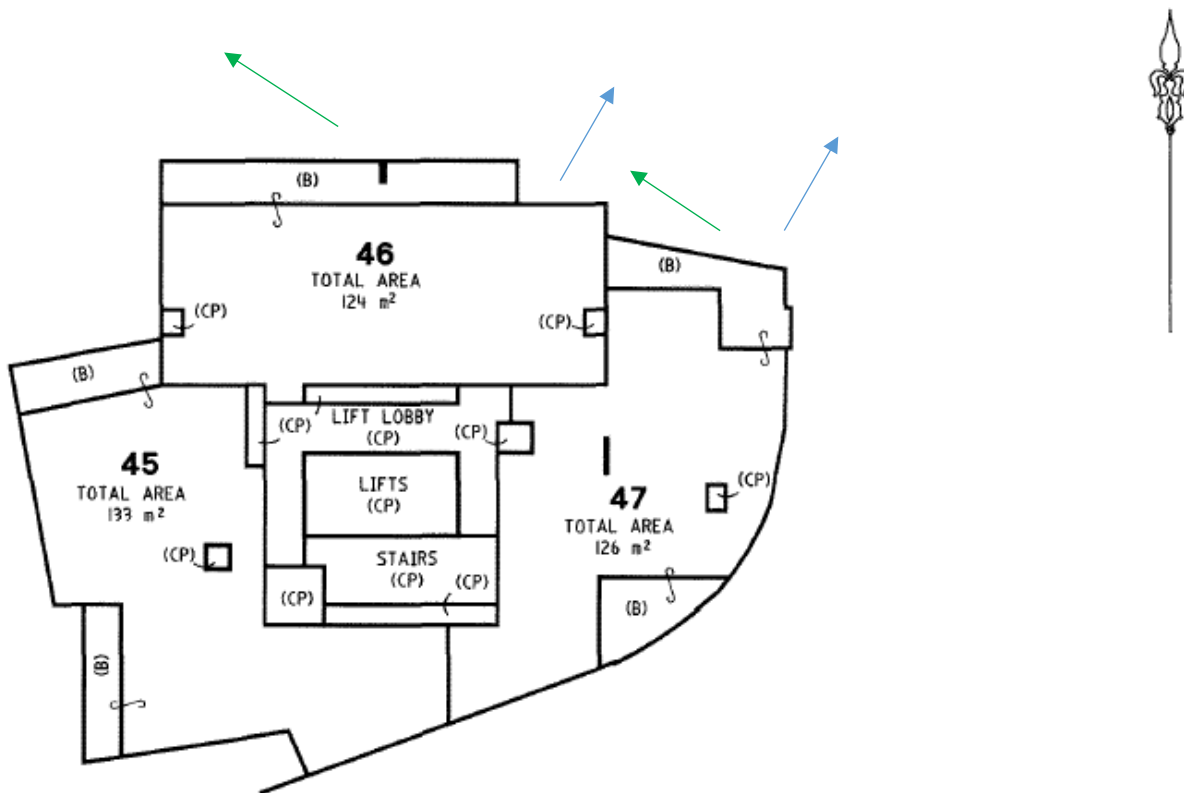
Strata Plan layout (typical) of Levels 10 and 11, at 417-419 Bourke Street, Surry Hills
